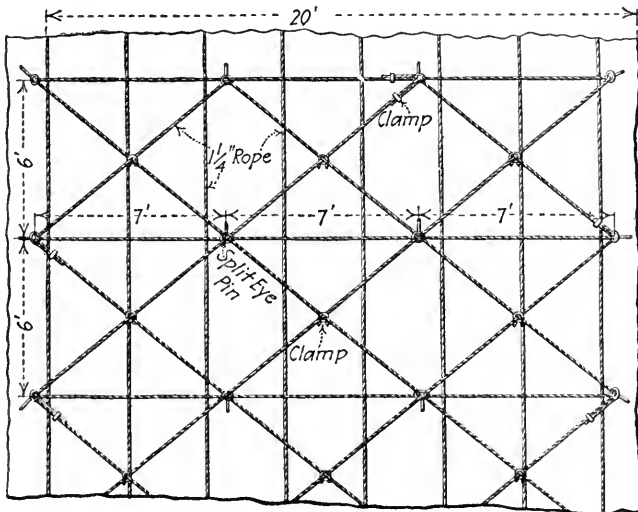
ROPE REINFORCEMENT ON HANGING WALL.
